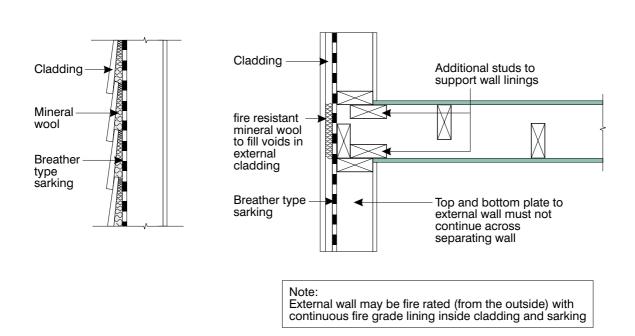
INTERSECTION WITH LIGHTWEIGHT CLAD EXTERNAL WALLS
